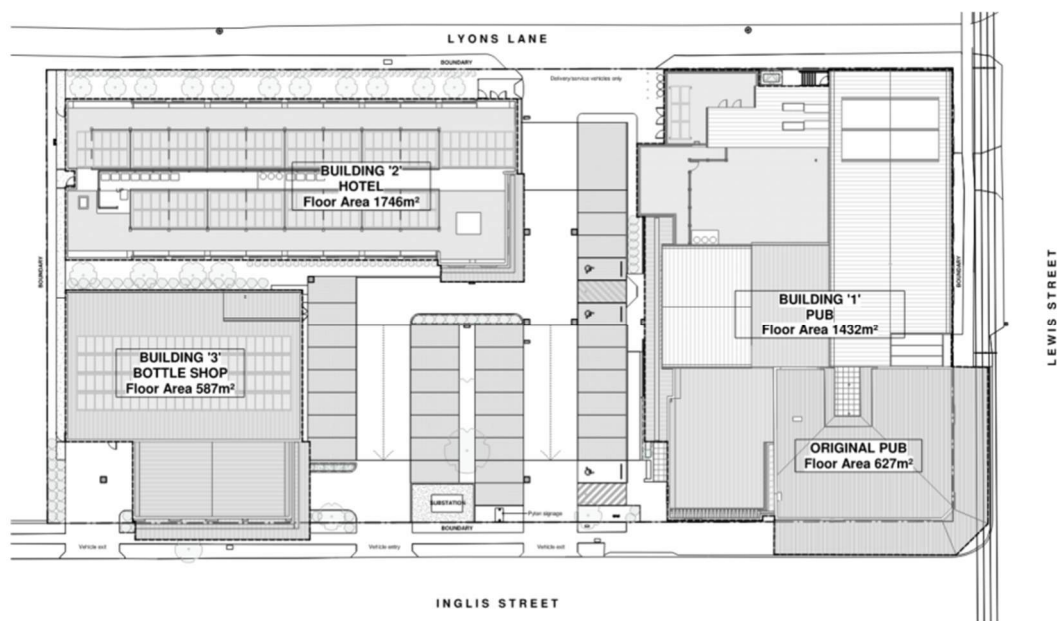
Site Plan – 34-42 Inglis Street, Mudgee
